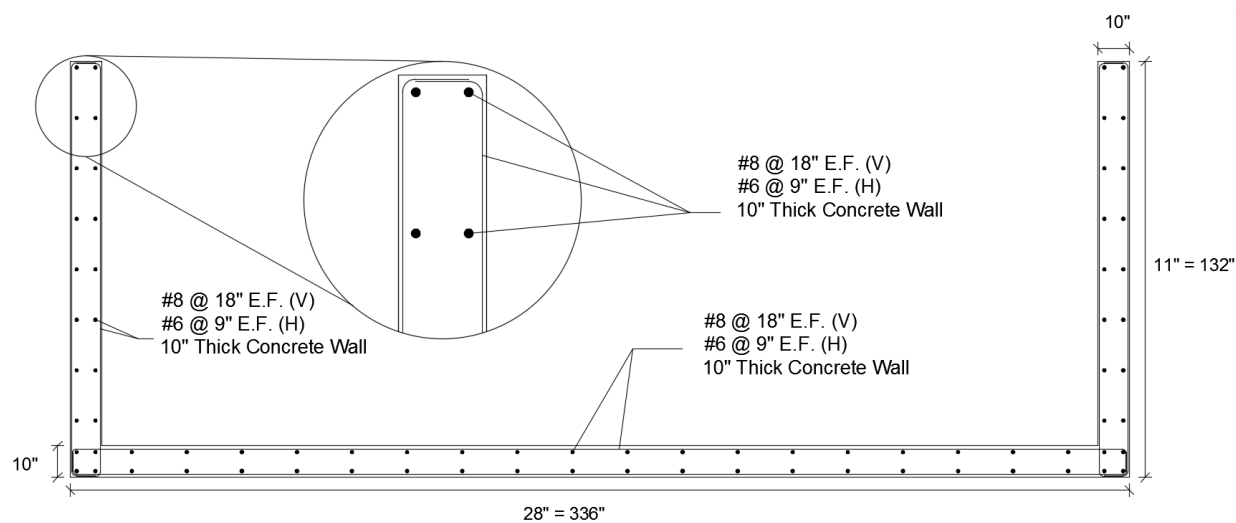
Original Elevator/ Mech. Room shear wall cross-section at the ground floor level
